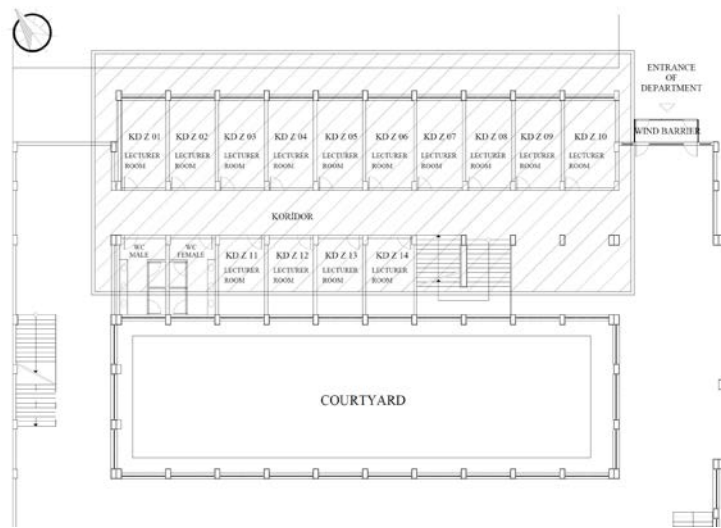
ESTU Industrial Engineering Department Ground Floor Plan
